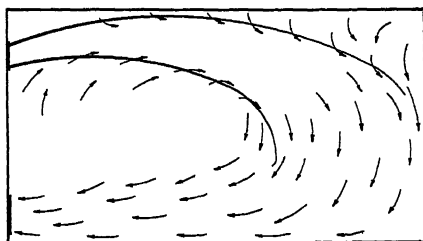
ELEVATION VIEW CORRECTLY LOCATED RETURN OUTLET
